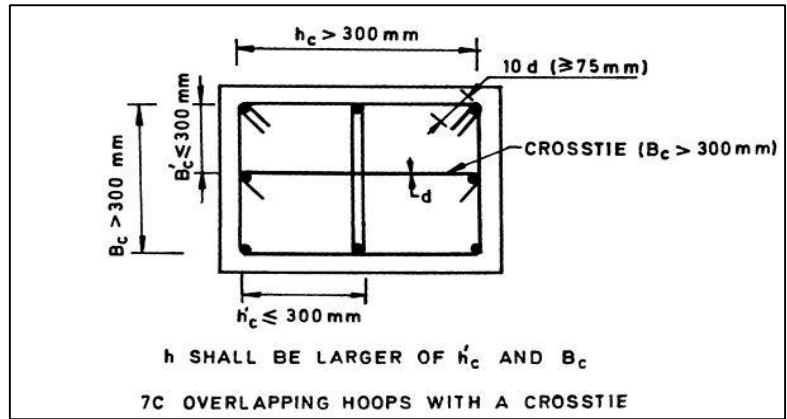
Shear Reinforcement in beams (Reference: IS 13920(2002))
